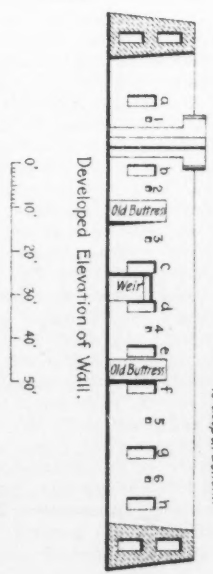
REINFORCEMENT OF WALL BETWEEN BASINS 1 AND 3.
